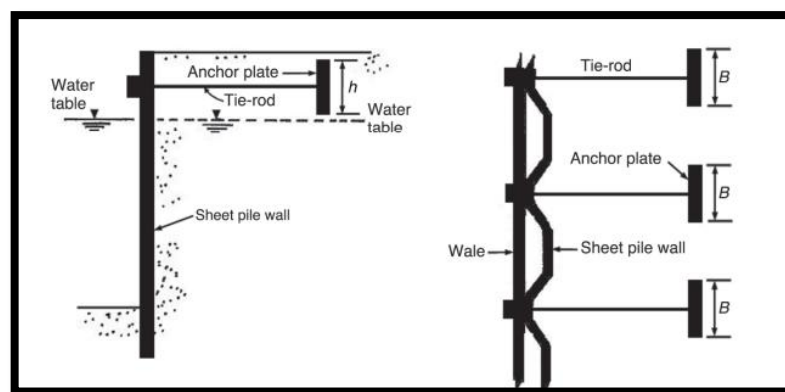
Use of vertical plate anchors in section, plan, and sheet pile wall
